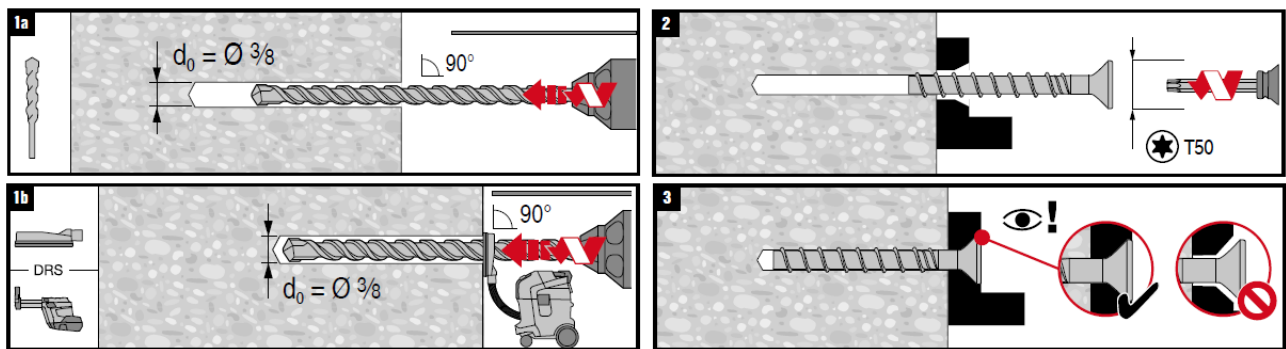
E—INSTALLATION INSTRUCTIONS – HILTI KH-EZ C AND KH-EZ C SS316 SCREW ANCHORS
